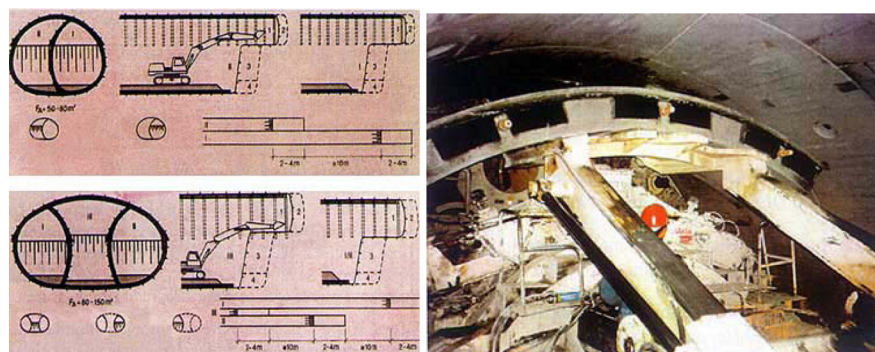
Excavation methods—conventional: top left– single sidewall drift;bottom left– twin sidewall drift, TBM technology (example from Paris metro)
